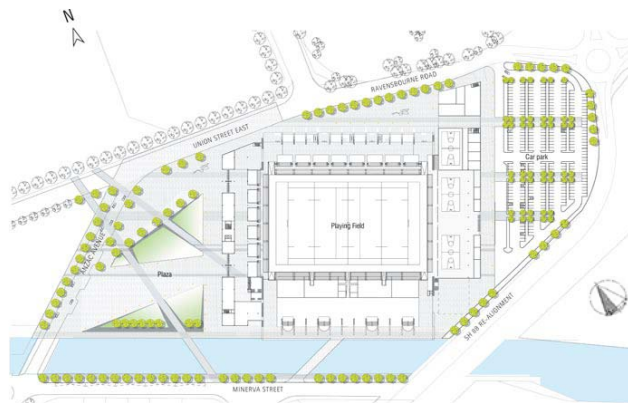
Landscape Plan (see Appendix for larger plan)
